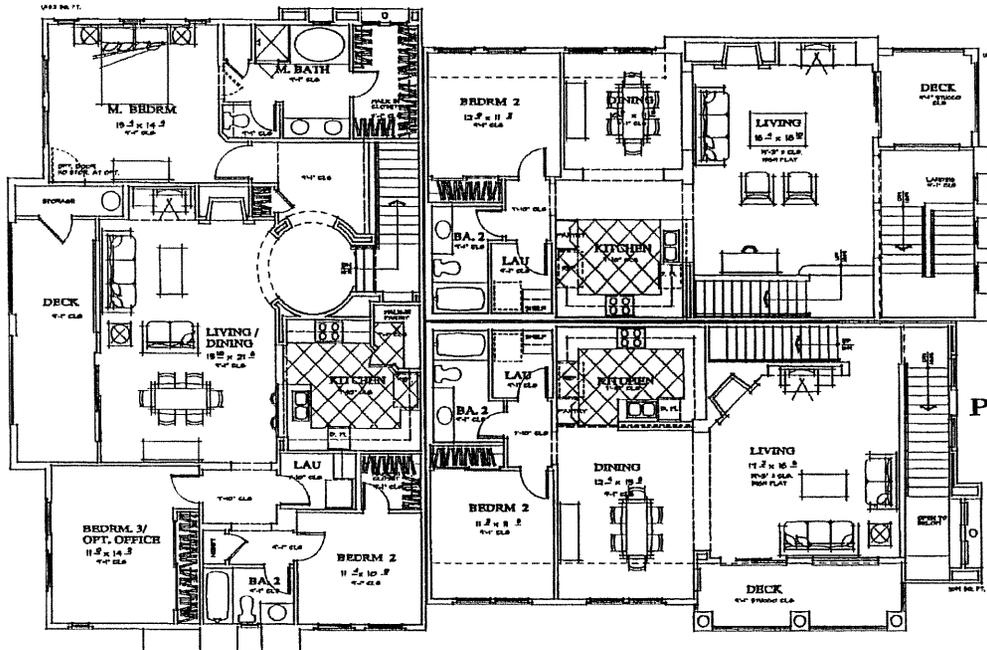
K - Arborelle - Building A - Floor Plans and Elevations
